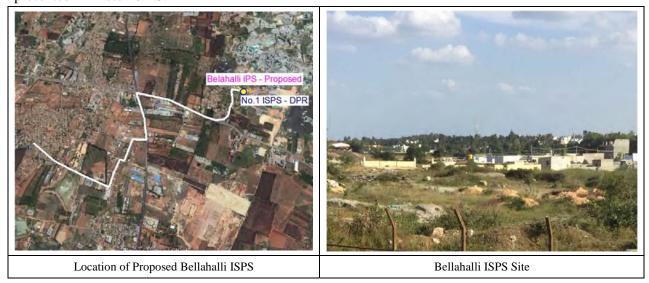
Location of Bellahalli ISPS and Alignment of Main Sewer Line
